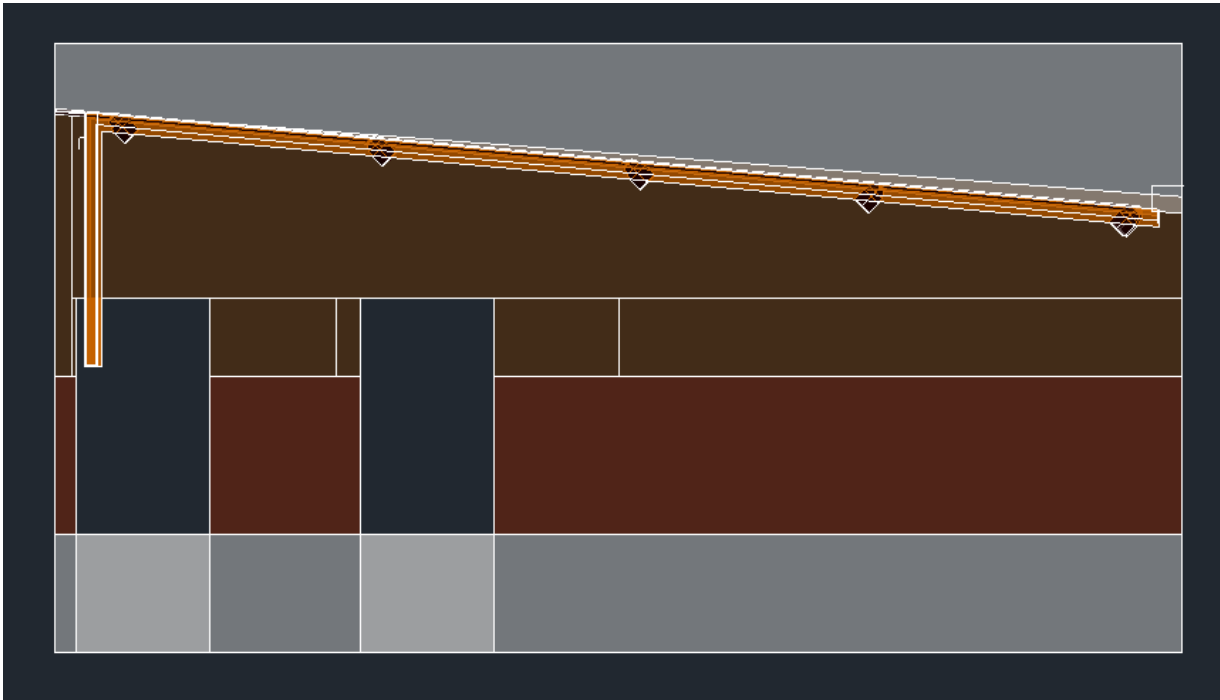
AutoCAD Elevation looking Northeast into the Dance Rehearsal Room
